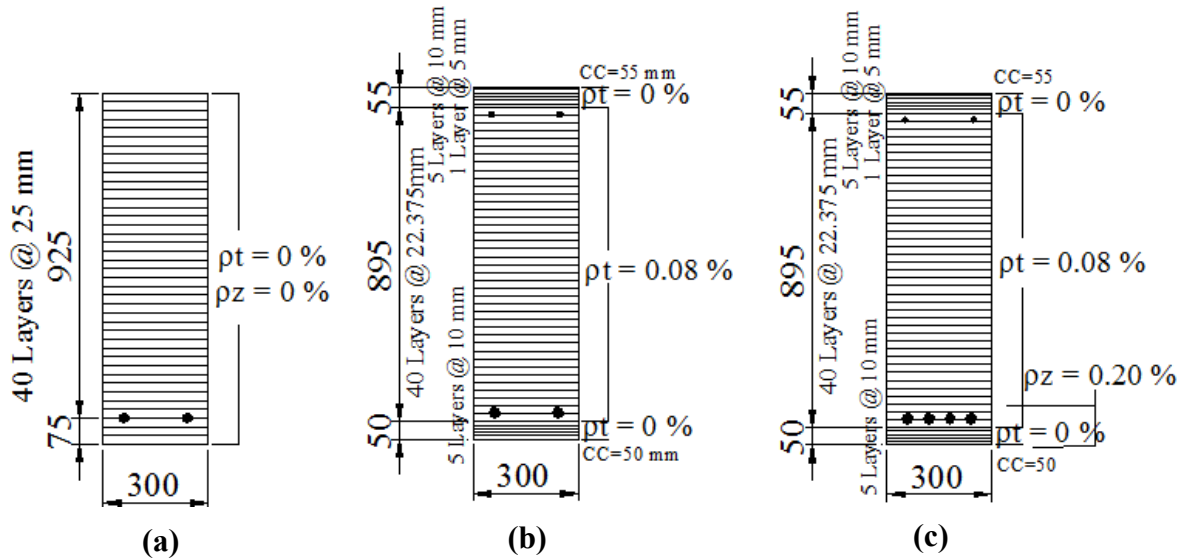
Sectional Models for Angelakos Beams (a) All Beams Containing no Transverse Reinf.; (b) Beams Containing Transverse Reinforcement; (c) Beam DB120M
